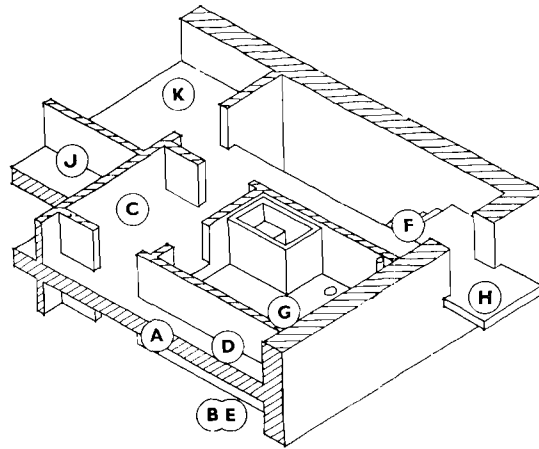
The Danish Building Manual “Byggebogen” contains systematic surveys of design details in connection with walls, partitions, floors, flooring, roofing etc.
